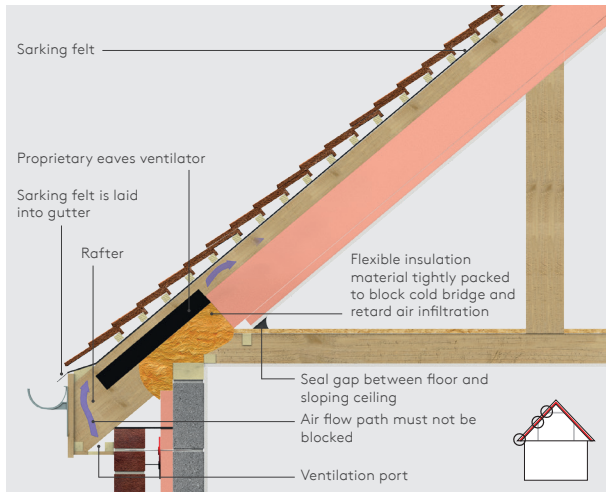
Overhanging eaves detail - section perpendicular to ridge
